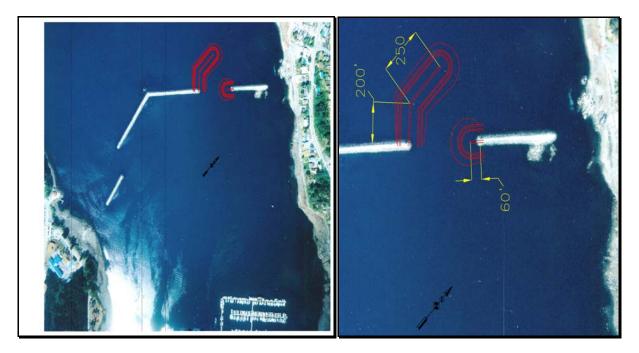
Alternative 15 would provide an angled extension to the main breakwater and a straight extension to the north breakwater, creating a 100 foot overlap – drawing not to scale.
